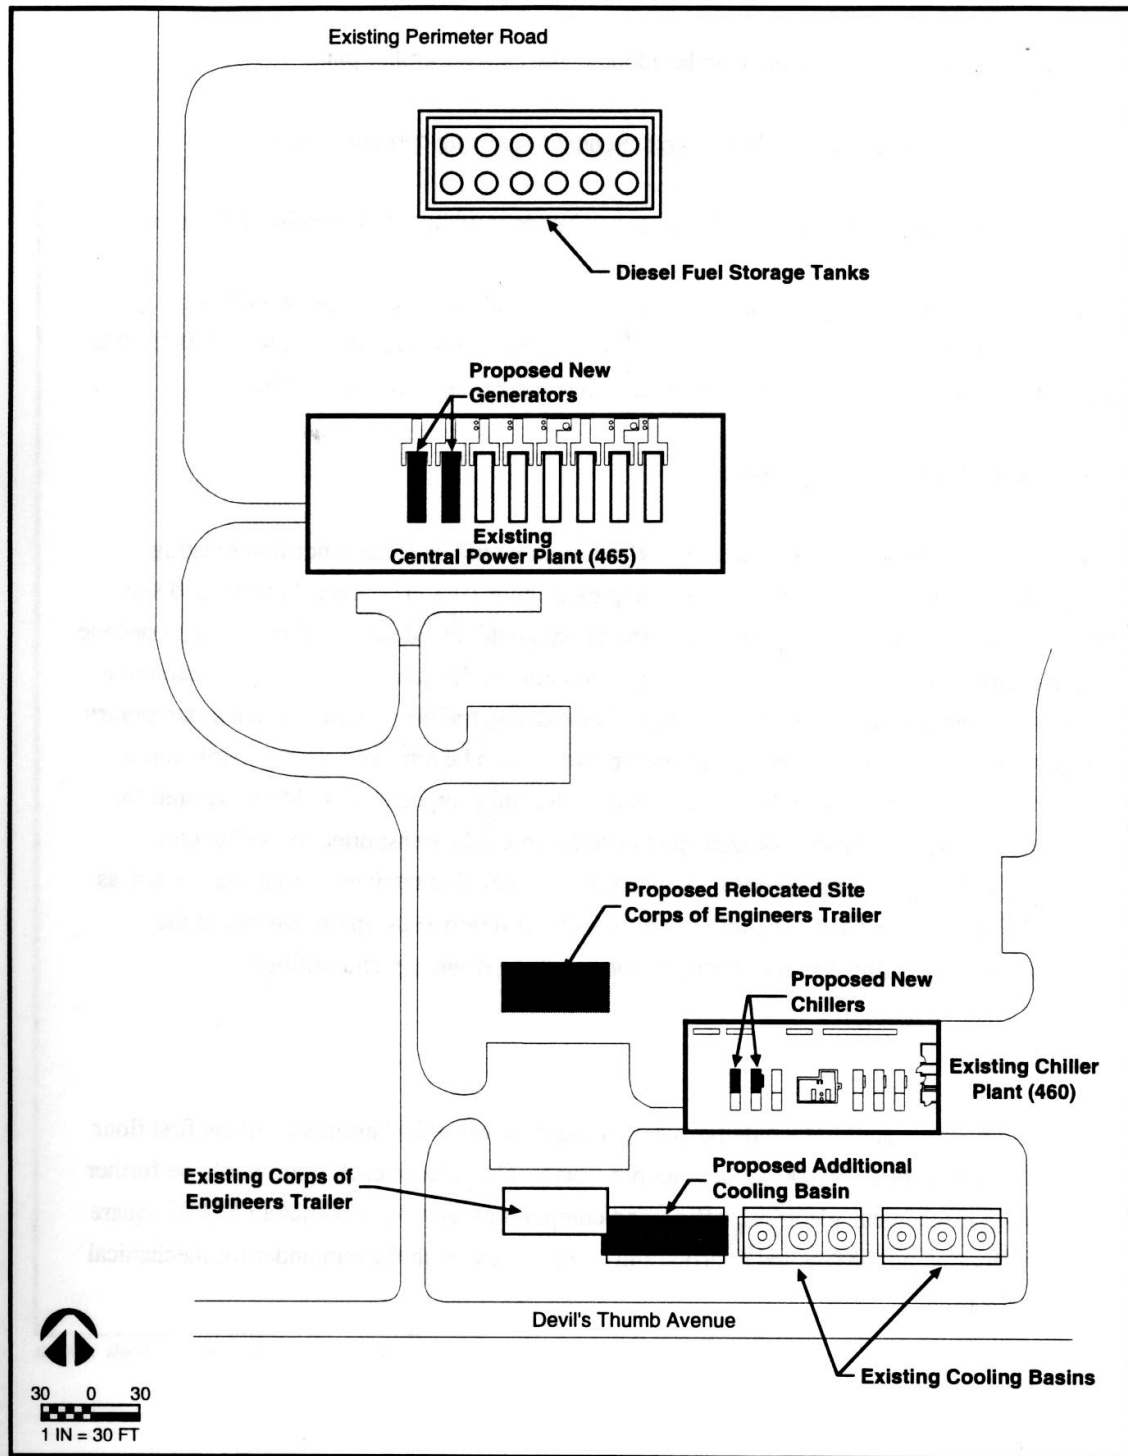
Site Plan Showing Existing Utilities and Proposed Modifications
